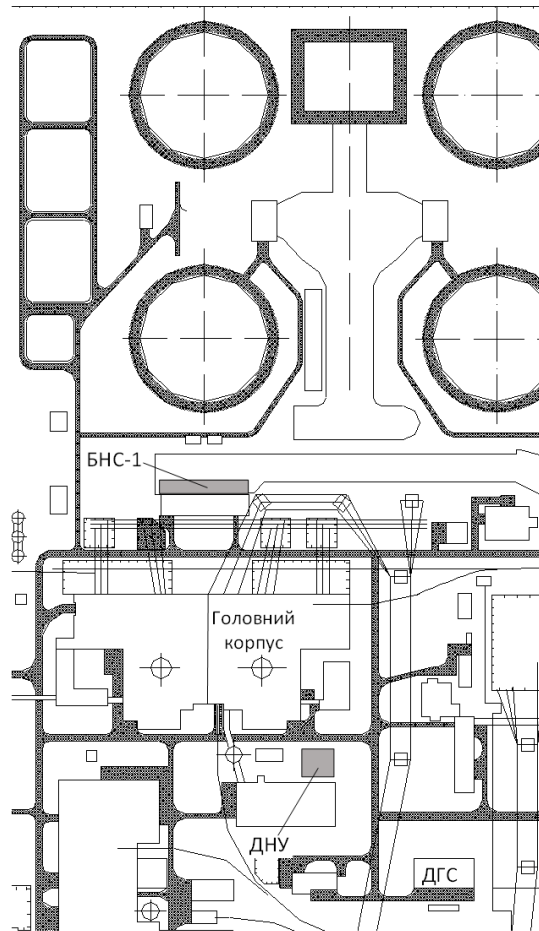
Layout of the main buildings of RNPP Unit 2
